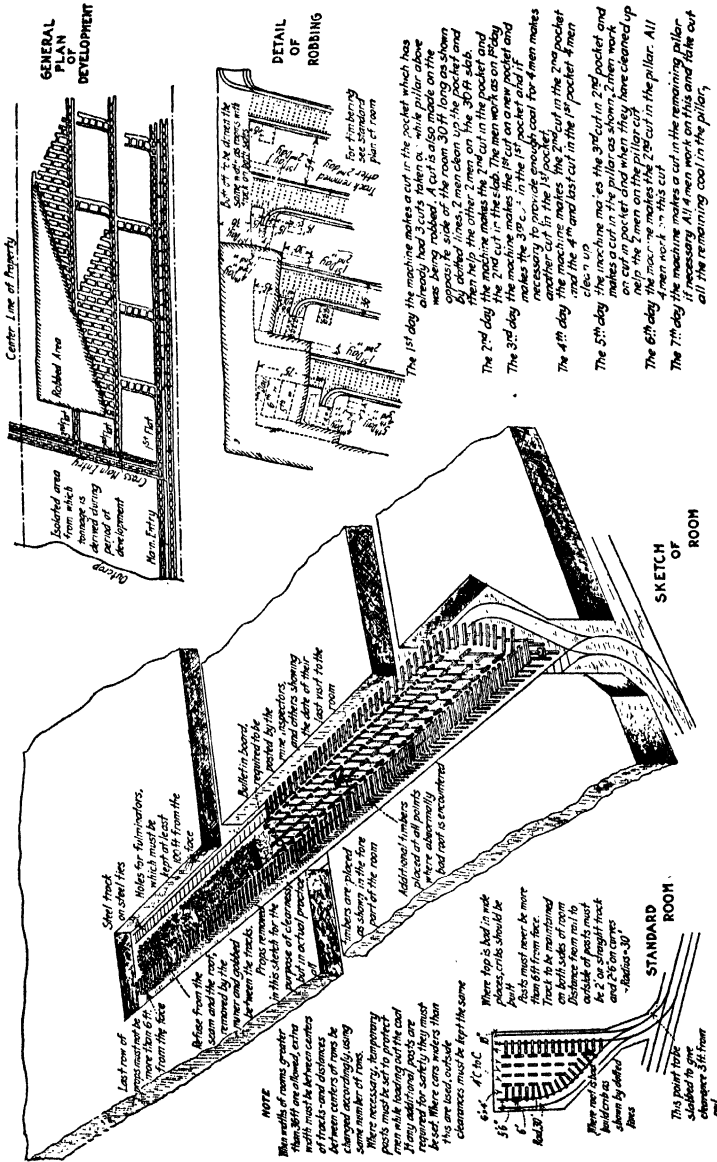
General plan and details used in the advancing system of mining, with rooms 36 ft. wide and 400 ft. long.
